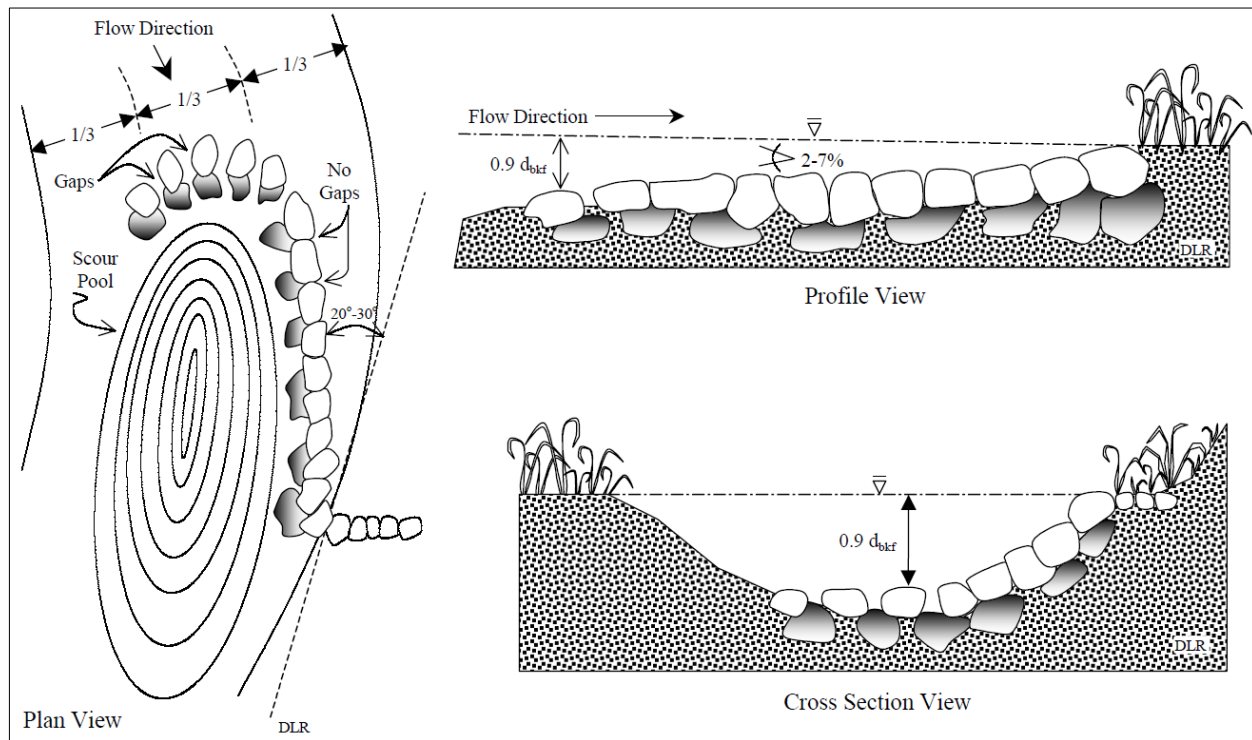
Generic J-Hook Vane Plan, Profile, and Cross-Sectional View Detail
